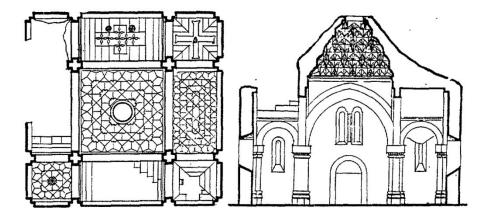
Plan and section of Astvatsankal Monastery (Ghazarian and Ousterhout, 2001)
